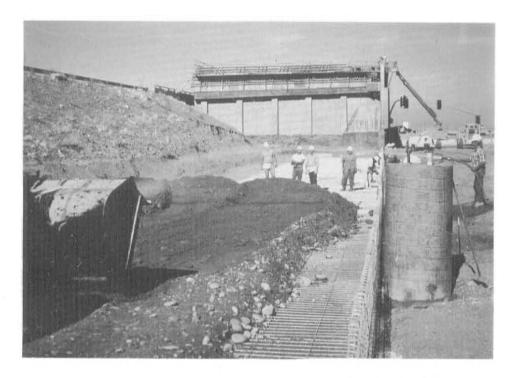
Backfill Material Distributed on the Reinforcing Mats.
